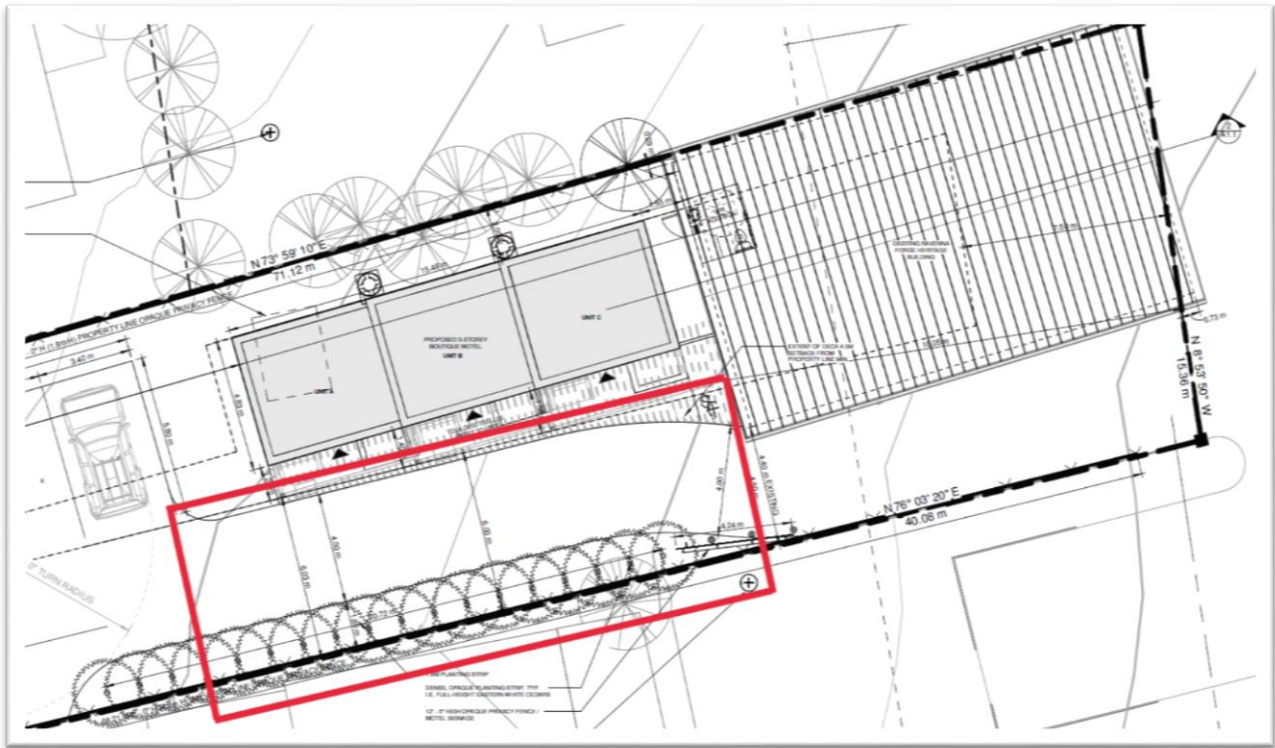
The proposed portion 4 m wide two-way parking aisle outlined in red.
